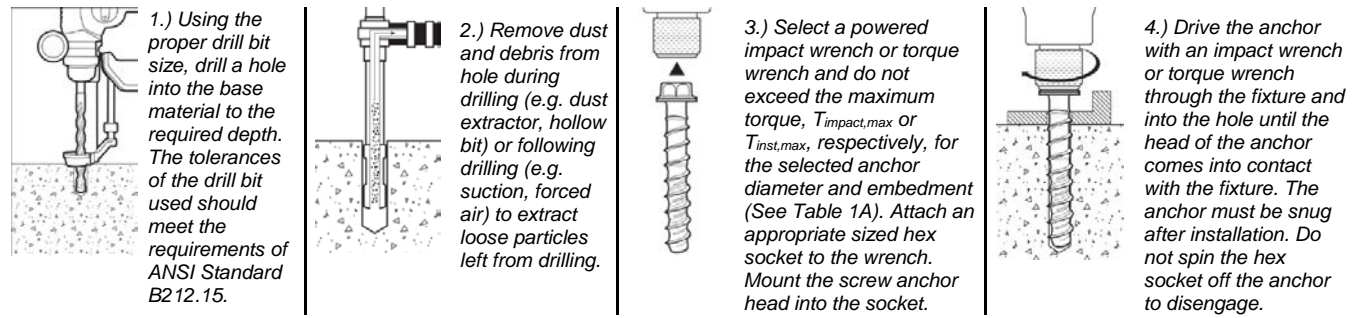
SCREW-BOLT+ INSTALLATION INSTRUCTIONS (Hex Head Version Illustrated, Flat Head Version is Not Shown)
